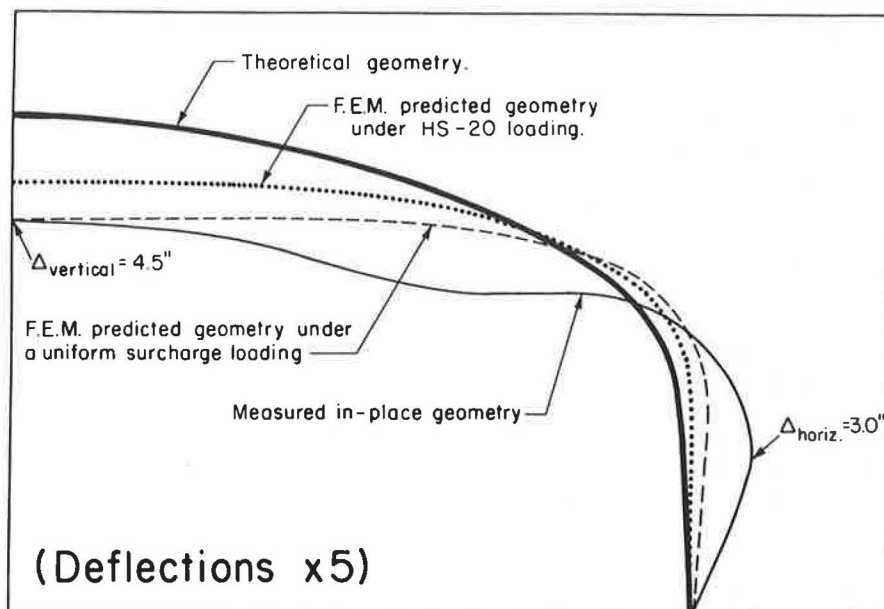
Undeformed and deformed geometries of Box Culvert 79C.
